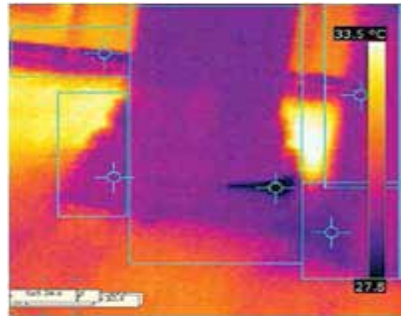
Infrared thermal imaging showing gap at joints of pillar where water was penetrating
